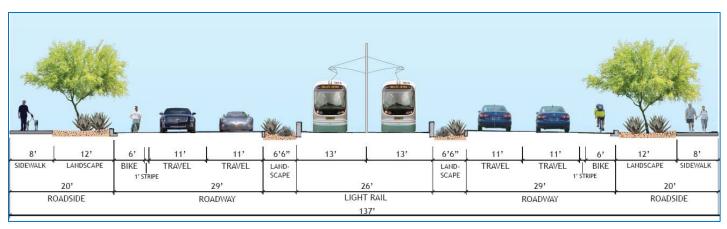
Standard Street Section Accommodates Future Transit (Light Rail)
